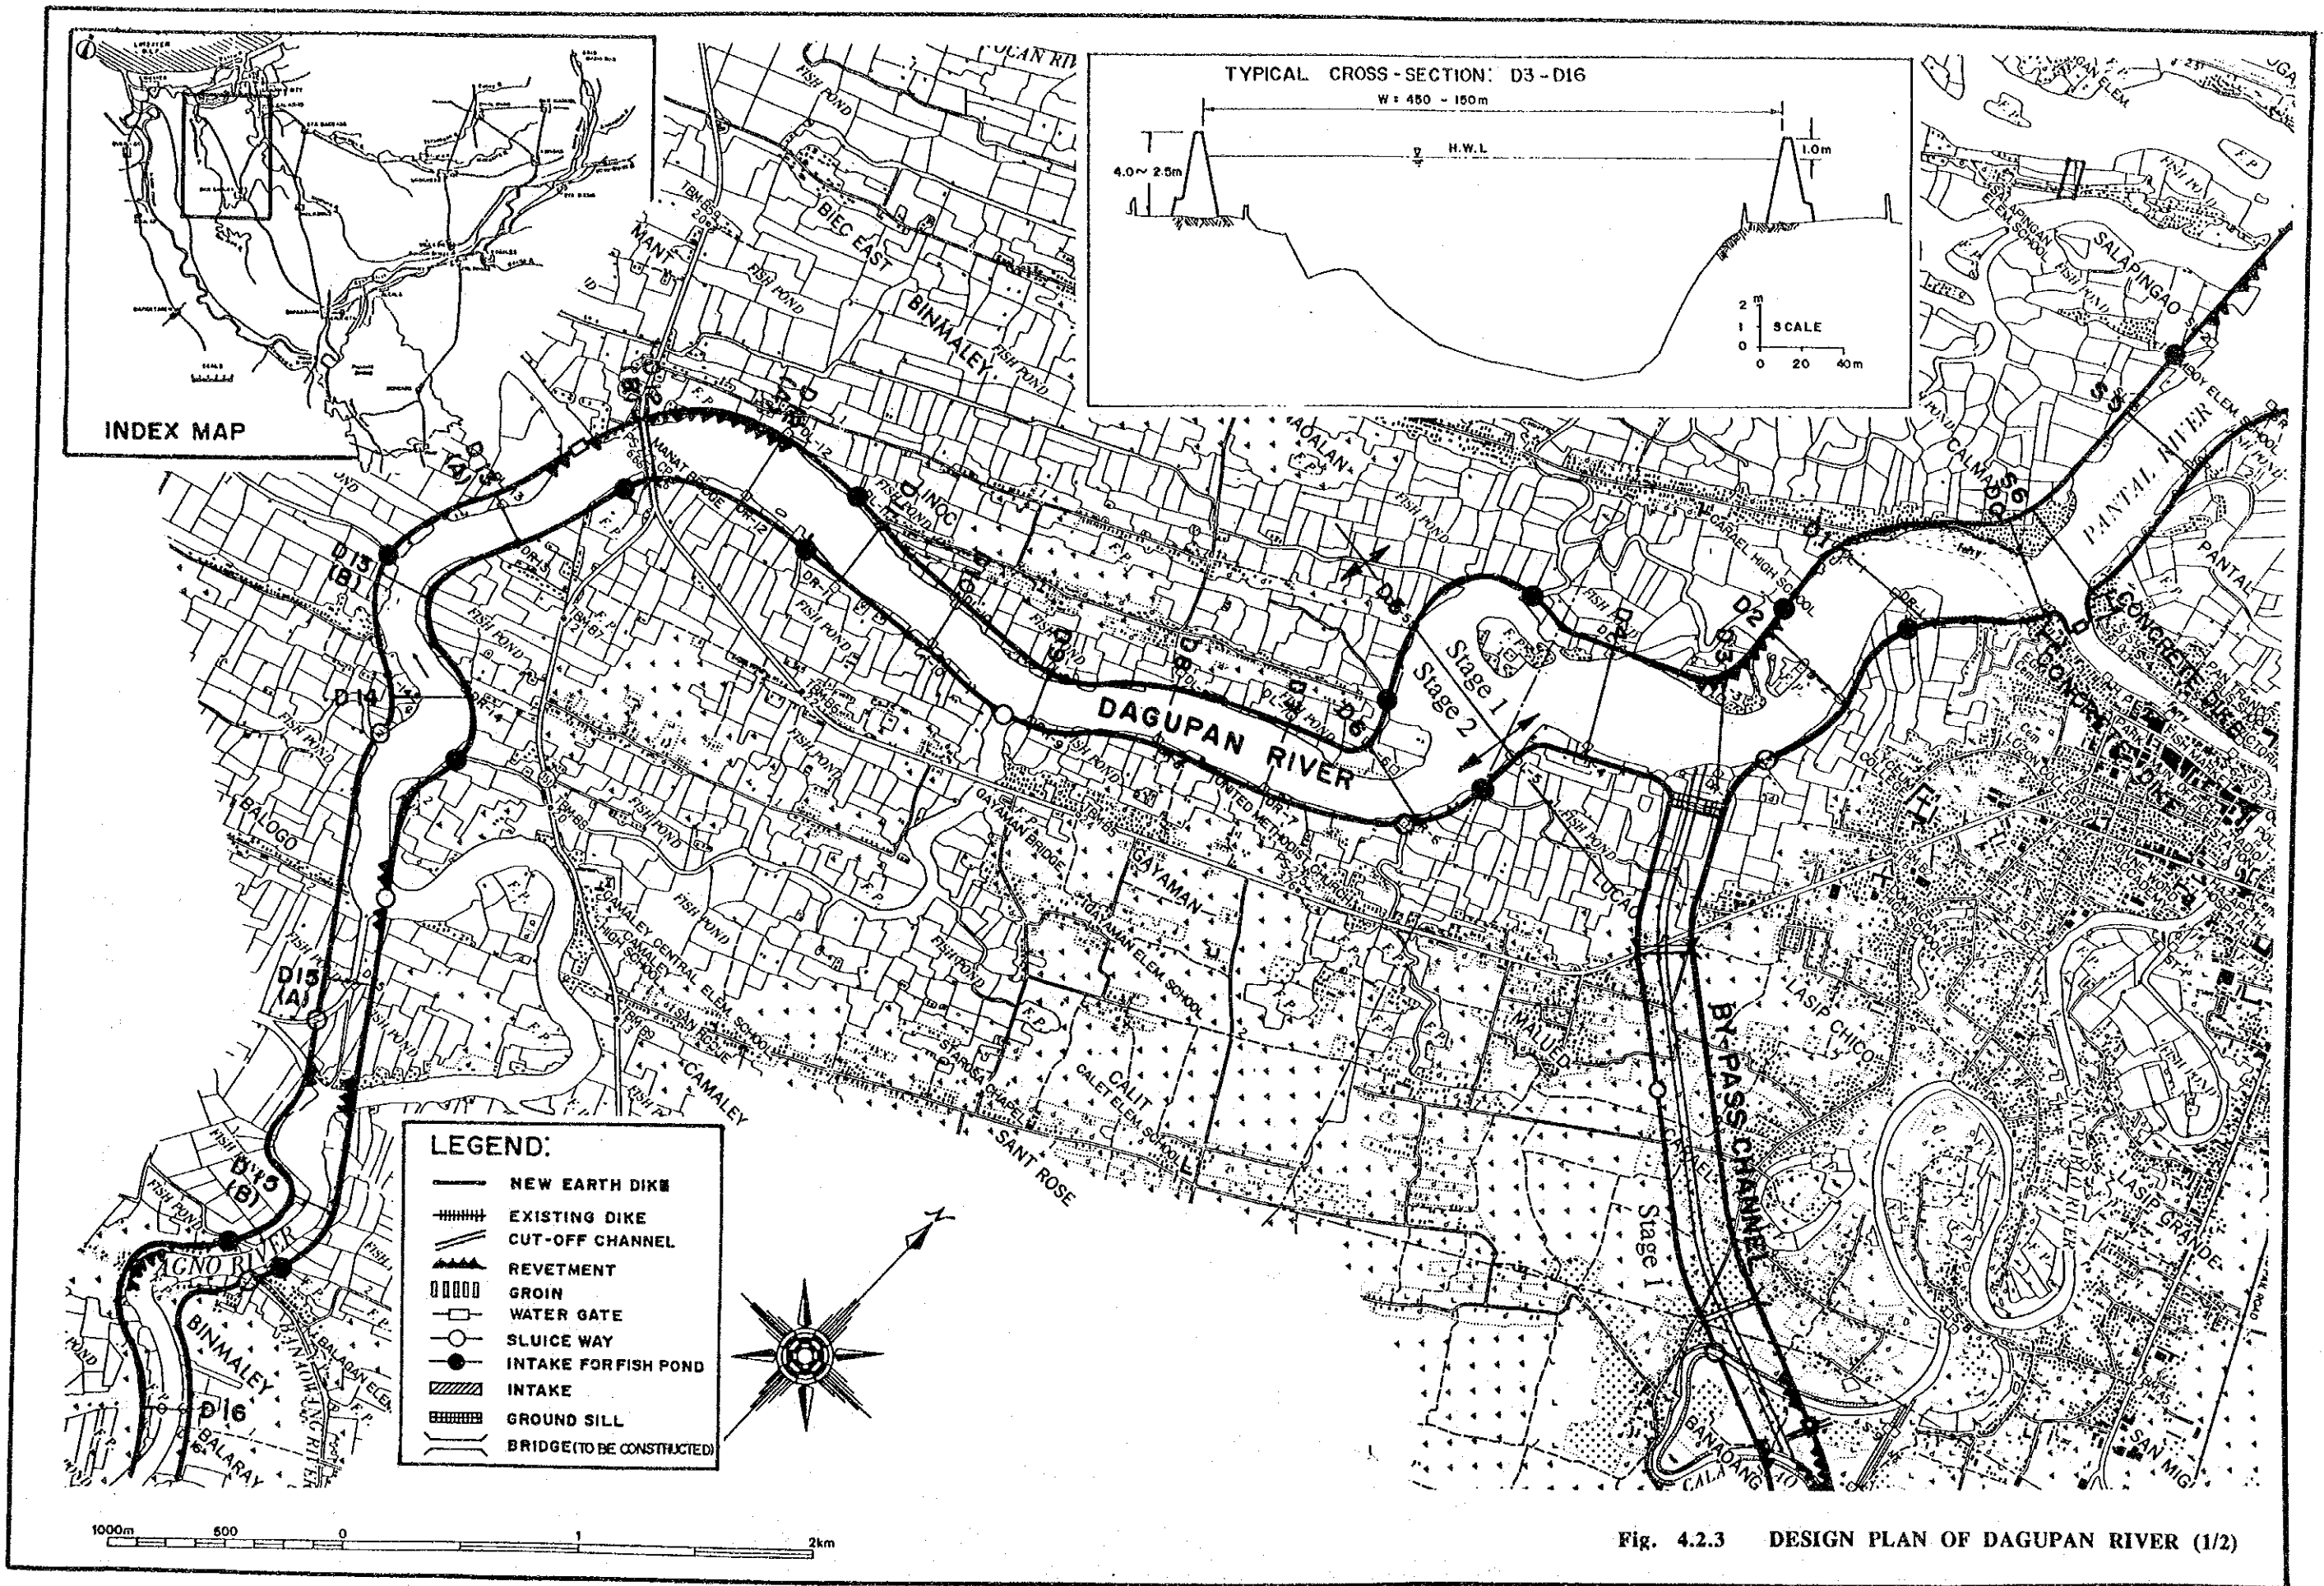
DESIGN PLAN OF DAGUPAN RIVER (1/2)
